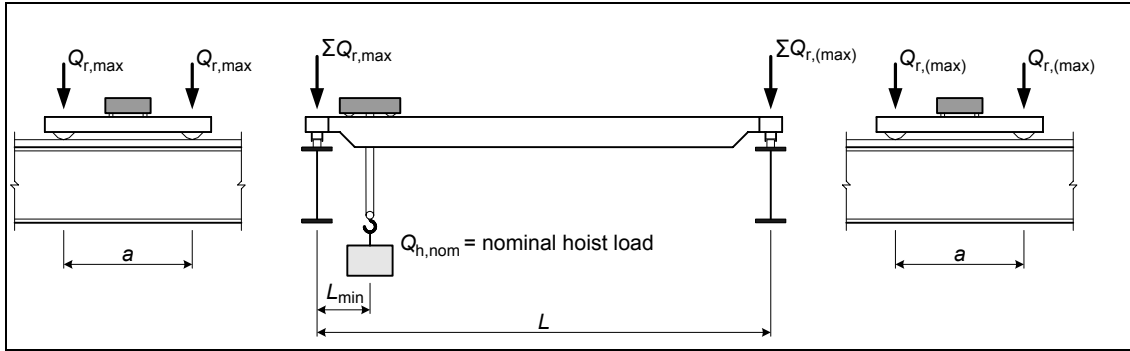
Load arrangements for maximum vertical action on the runway beams
